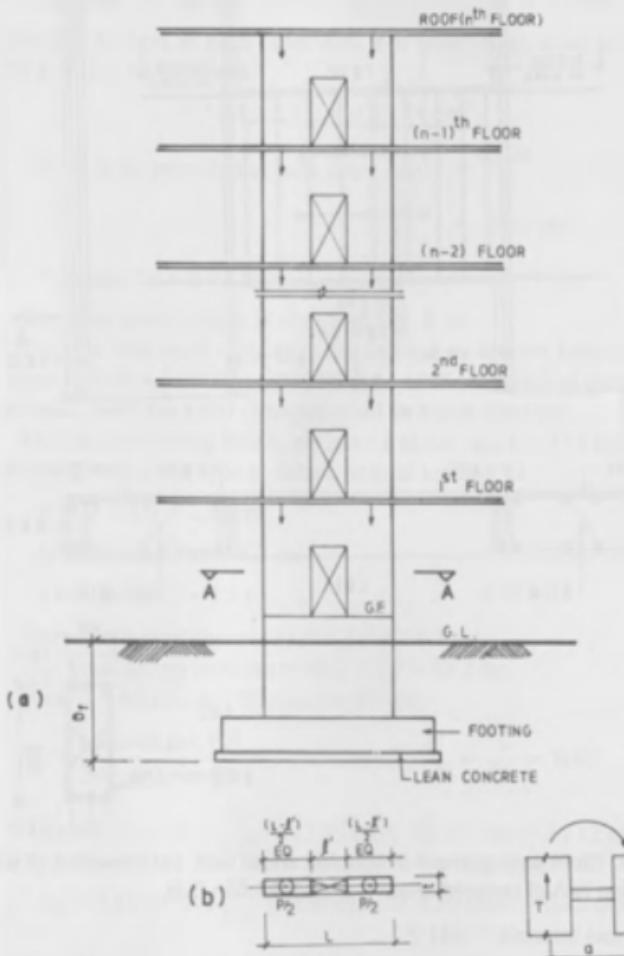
Coupled shear wall. (a) Elevation of coupled shear wall; (b) Section A-A.
